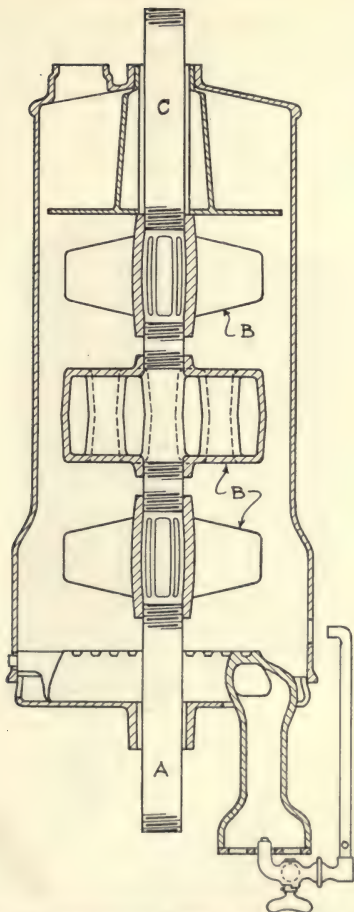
Cast Sectional Heater, page 732: A, Inlet Pipe; B, Sections; C, Outlet Pipe.
